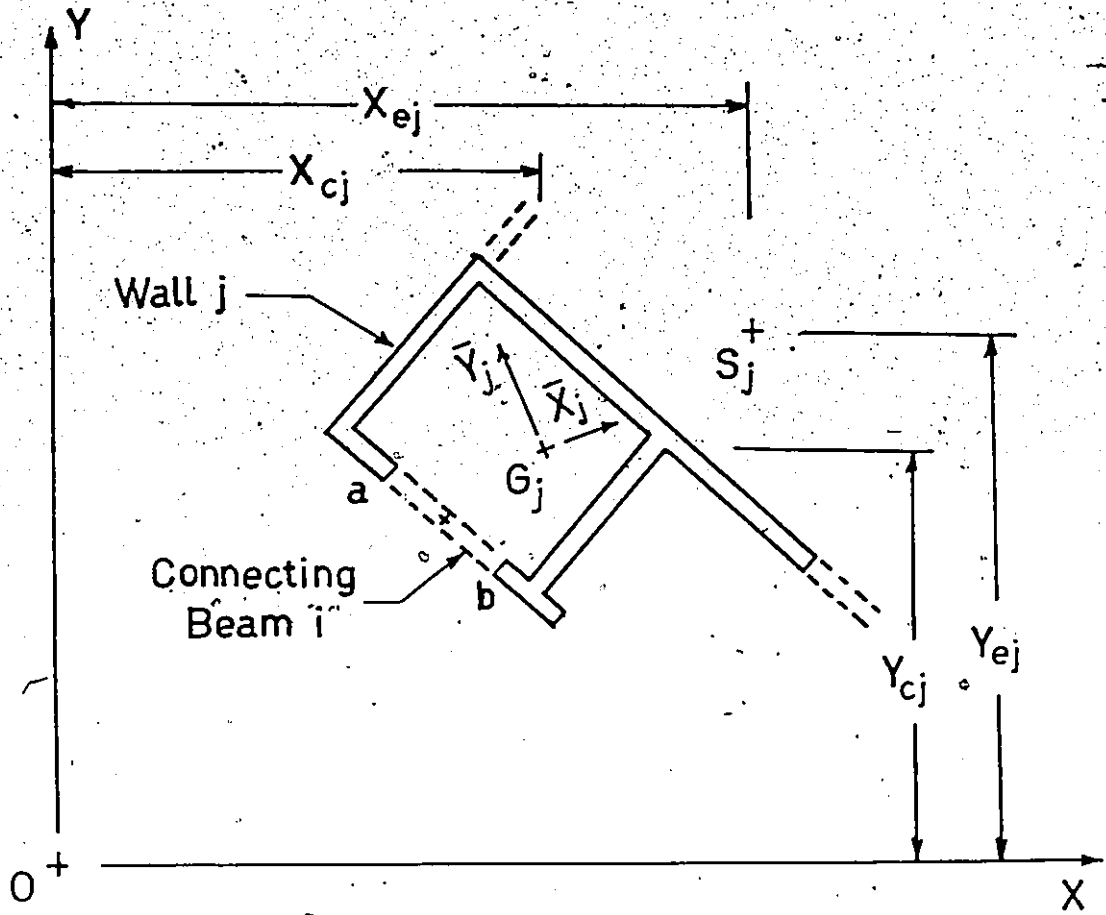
GEOMETRY OF SHEAR WALLS WITH TYPE 2 CONNECTING BEAM
